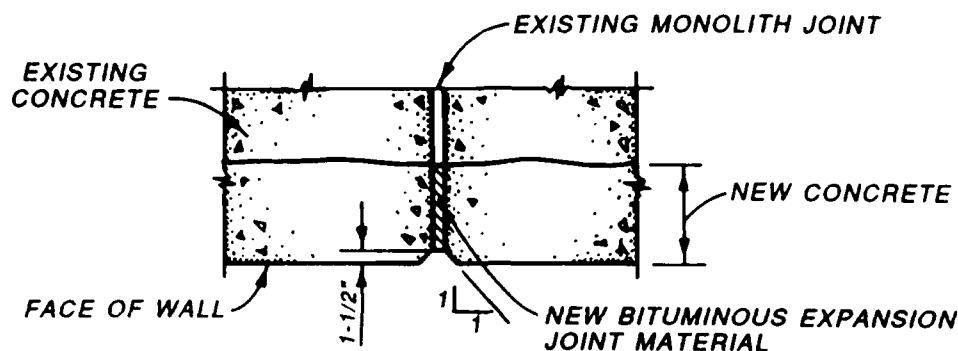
Conventional concrete-refacing monolith joint repair details, Emsworth Locks
